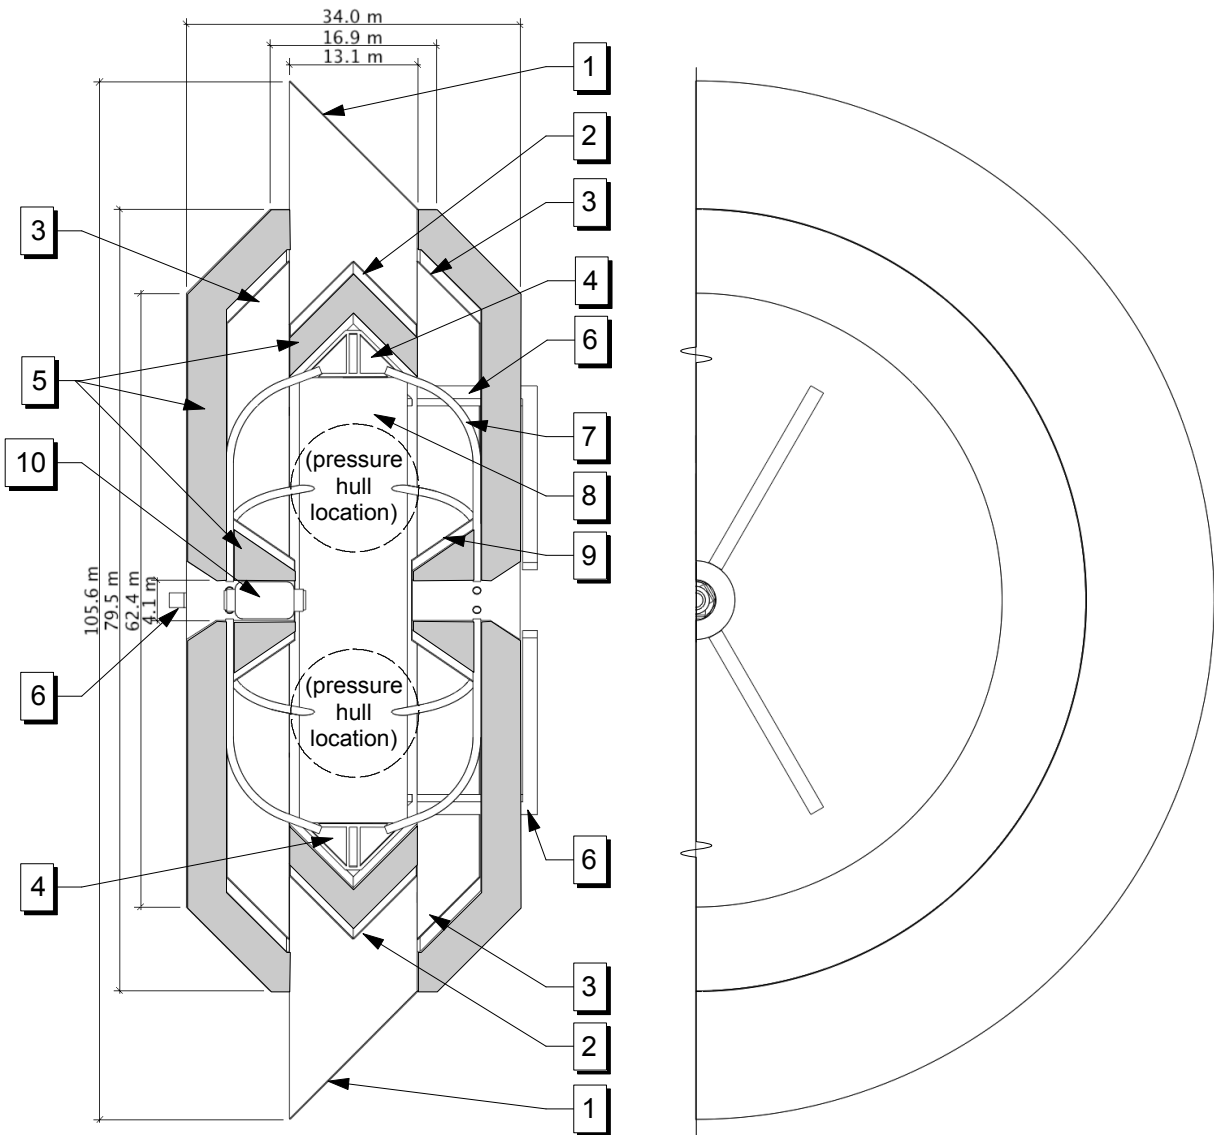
Section and Elevation of Shield Structure as prepared for first Growth Iteration
